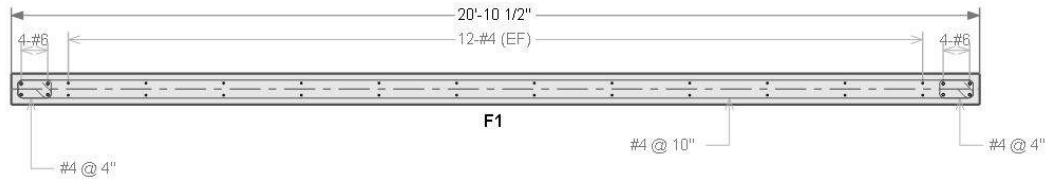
Schematic drawing of typical required shear wall reinforcement
